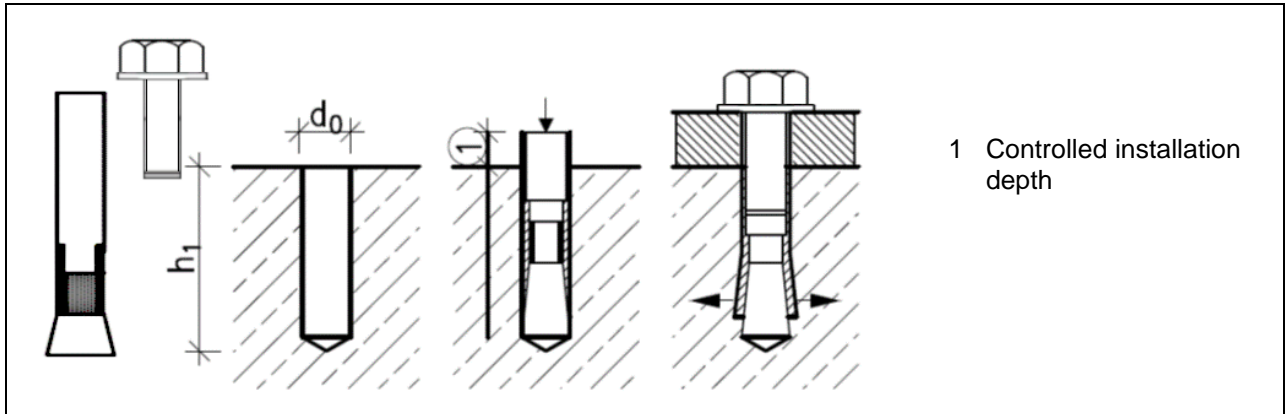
Sleeve-down type fastener; drilling with stop drill
